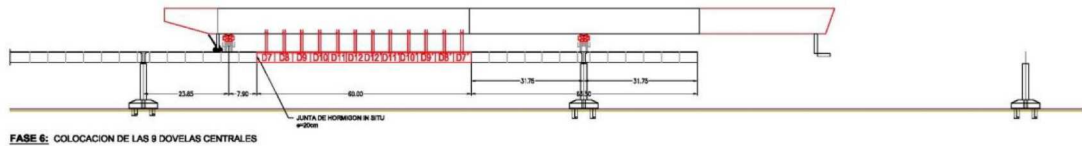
Second stage. Erection and prestressing of mid-span segments.
